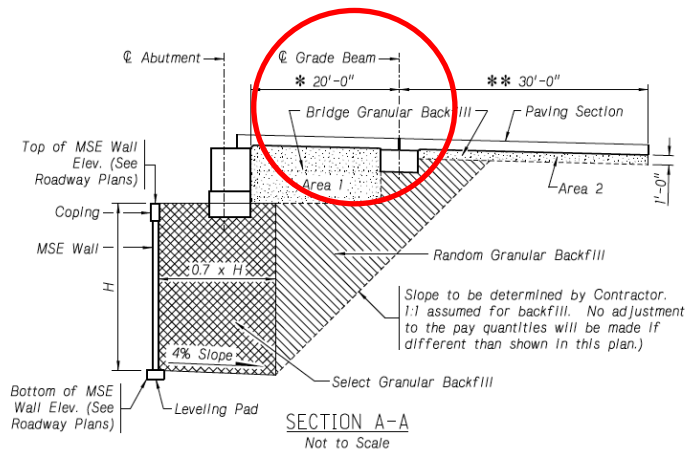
Grade Beam Supporting the Approach Span Attached to the Integral Abutment Bridge (drawings retrieved from Big Springs, Nebraska West I-80 Loop Bridge)
